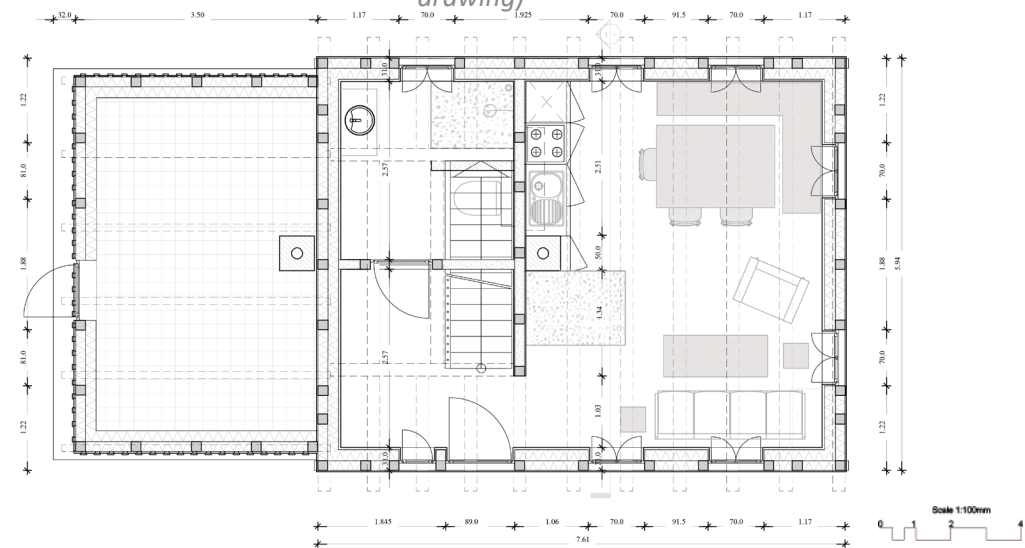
First floor plan - Scale 1:100 (Author's drawing)
